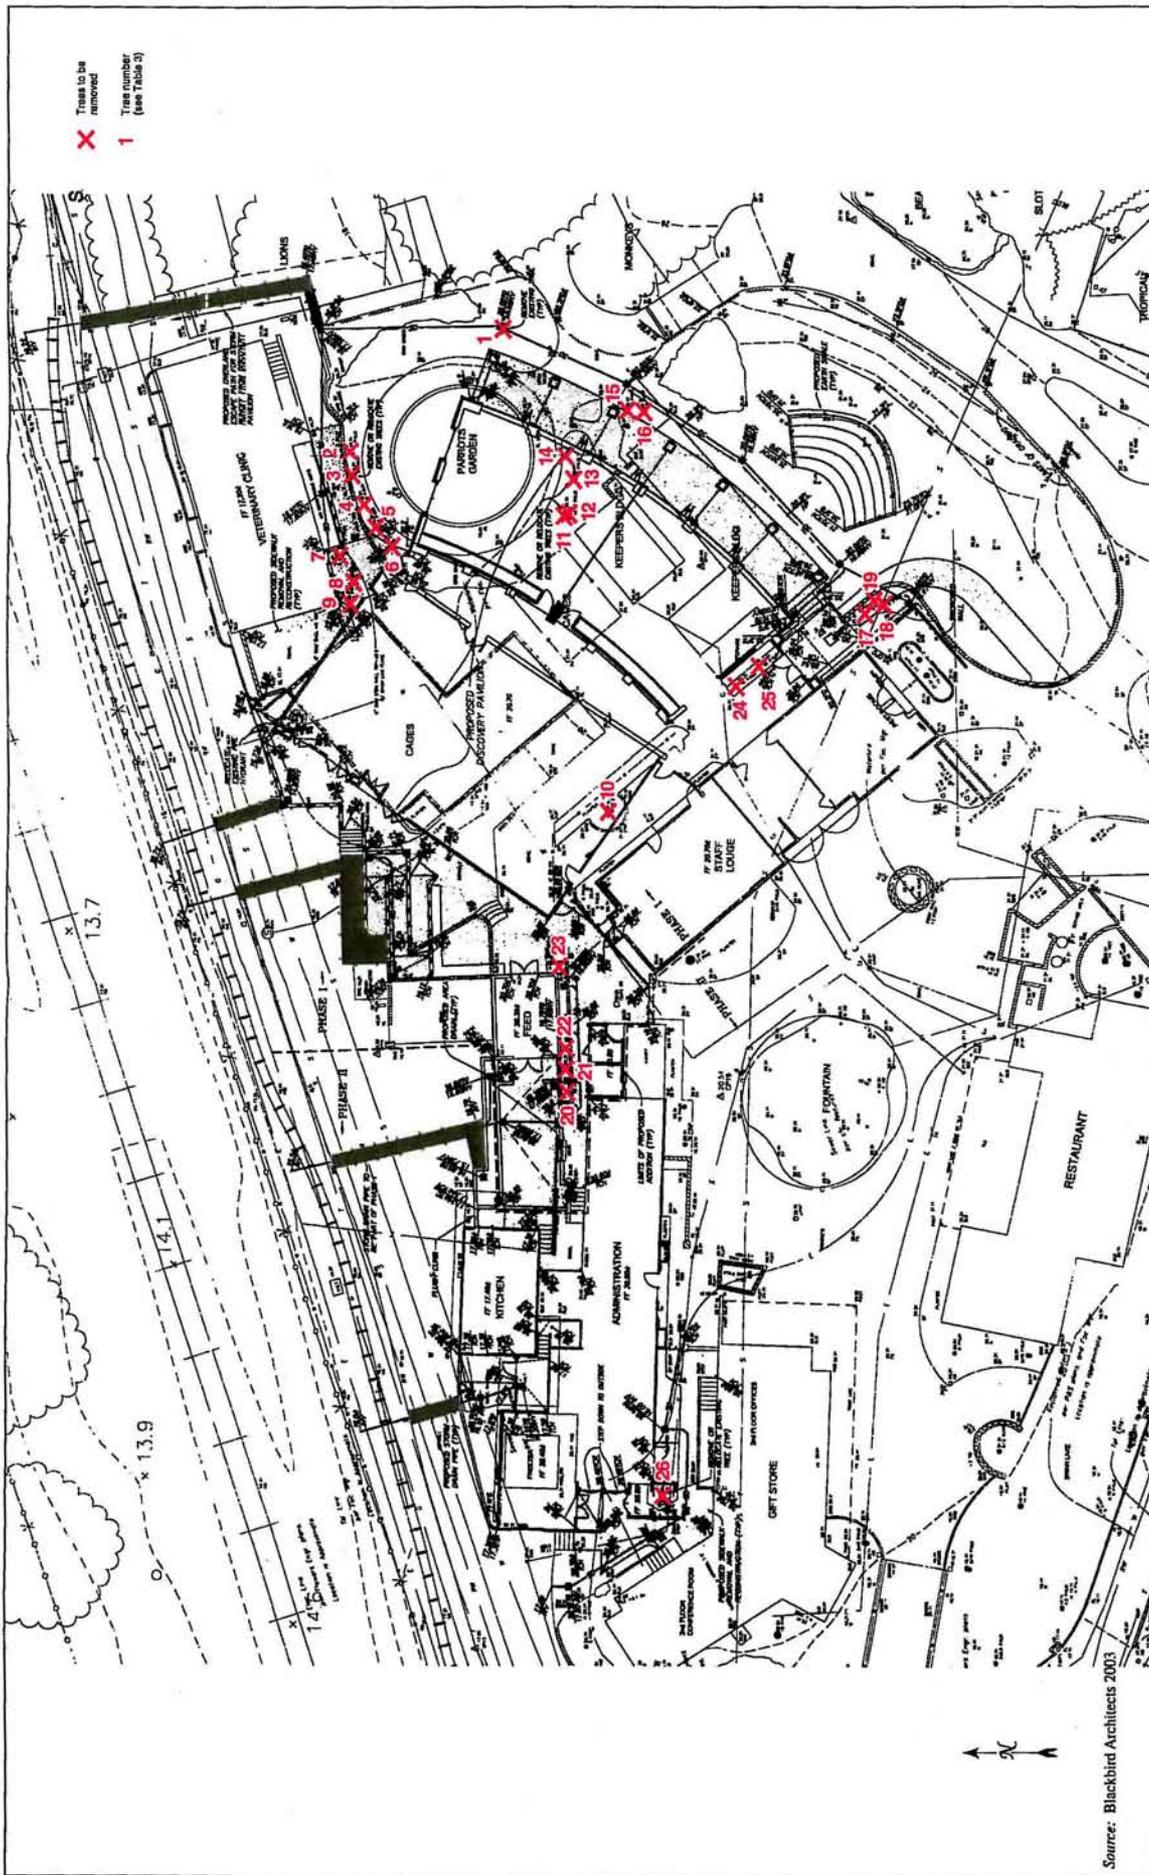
Santa Barbara Zoological Gardens Site Plan with General Locations of Proposed Projects
